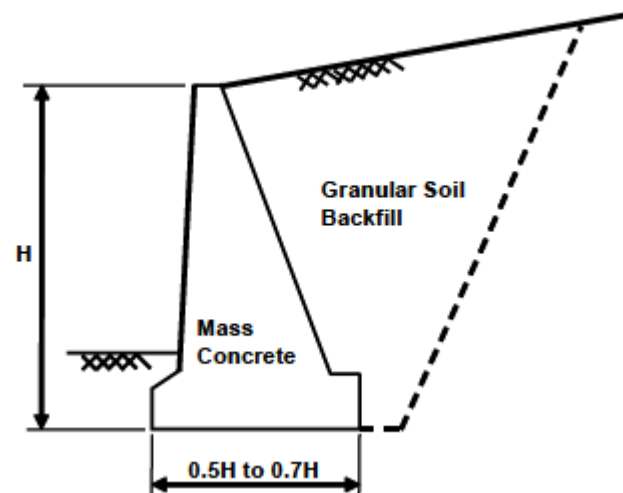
CAST-IN-PLACE GRAVITY WALL
